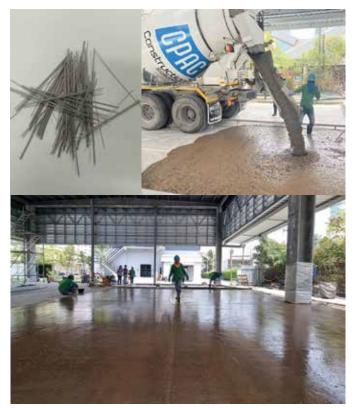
Fibers used in LC3 concrete and casting fiber-reinforced LC3 concrete
